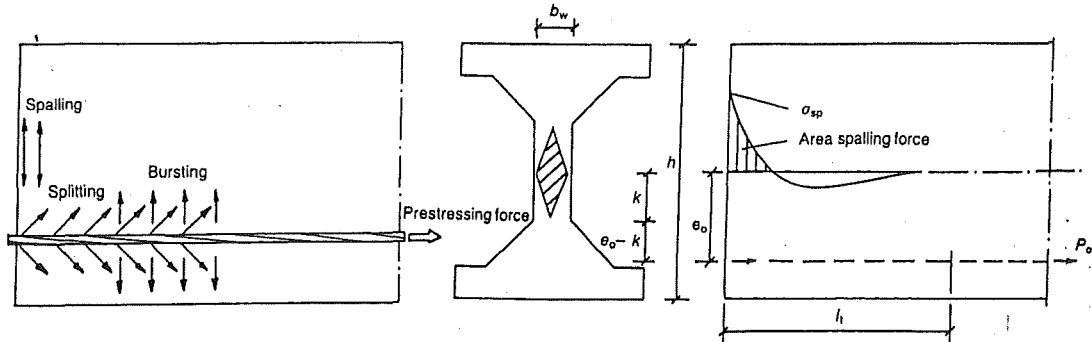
Spalling, splitting and bursting stresses in hollow core sections [FIP, 1988]
